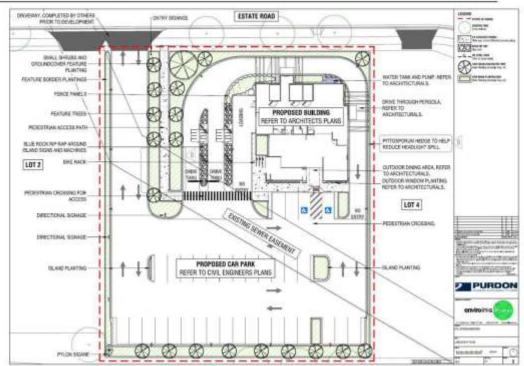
Landscape Plan 2 (Source: Enviro Links Design)
